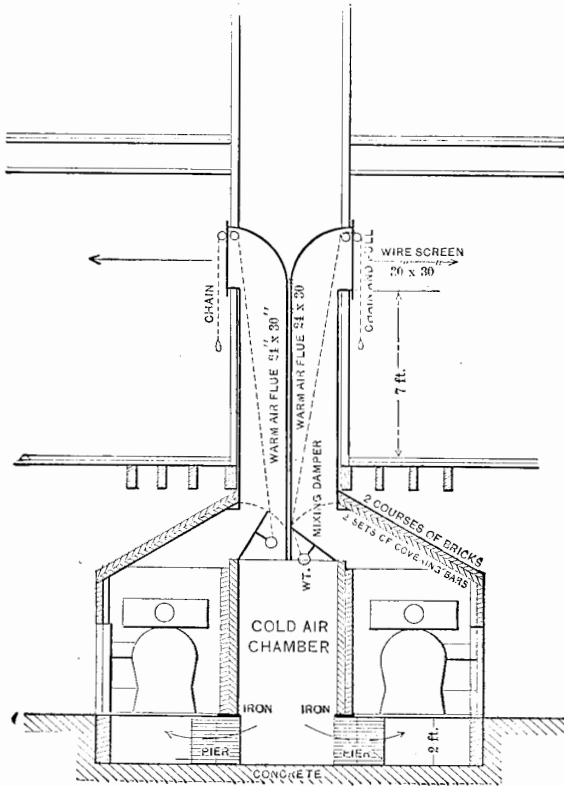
Sectional View of Furnaces on Line A A of Fig. 28.
